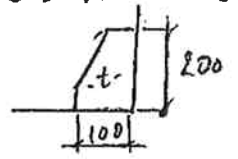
BARRIER (EQUAL TO MINI-STEP BARRIER; INFO: I2-14 TO 16)
